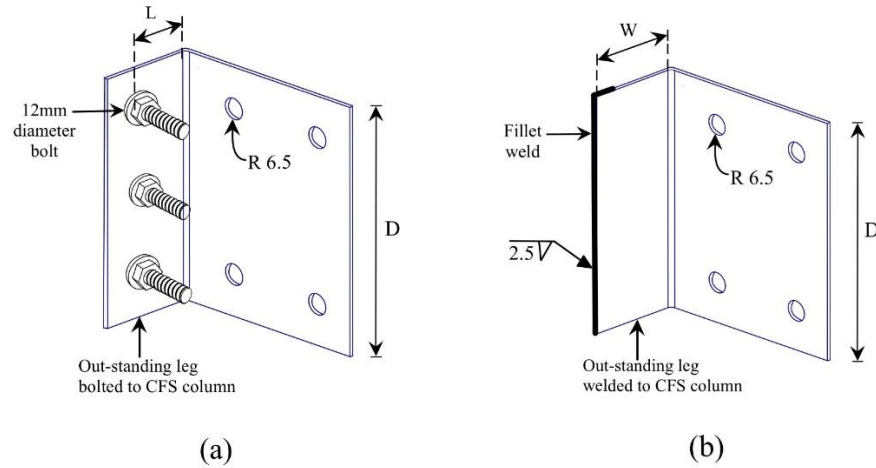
Clip-angle configurations: (a) 3-bolted; (b) Welded
